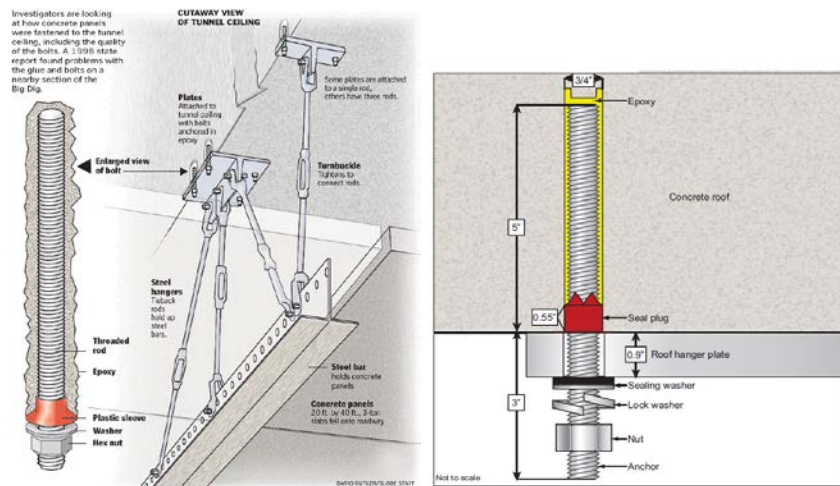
Ted Williams Tunnel cutaway view of tunnel ceiling structure [27].
